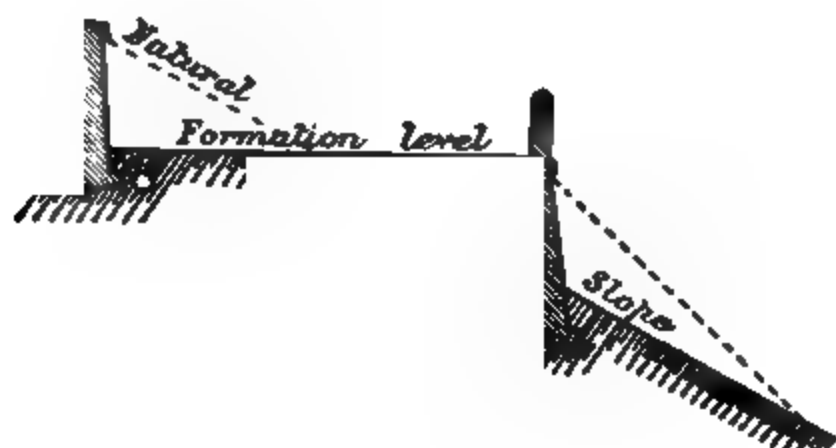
Road Construction on Hillside, with Retaining Walls.
